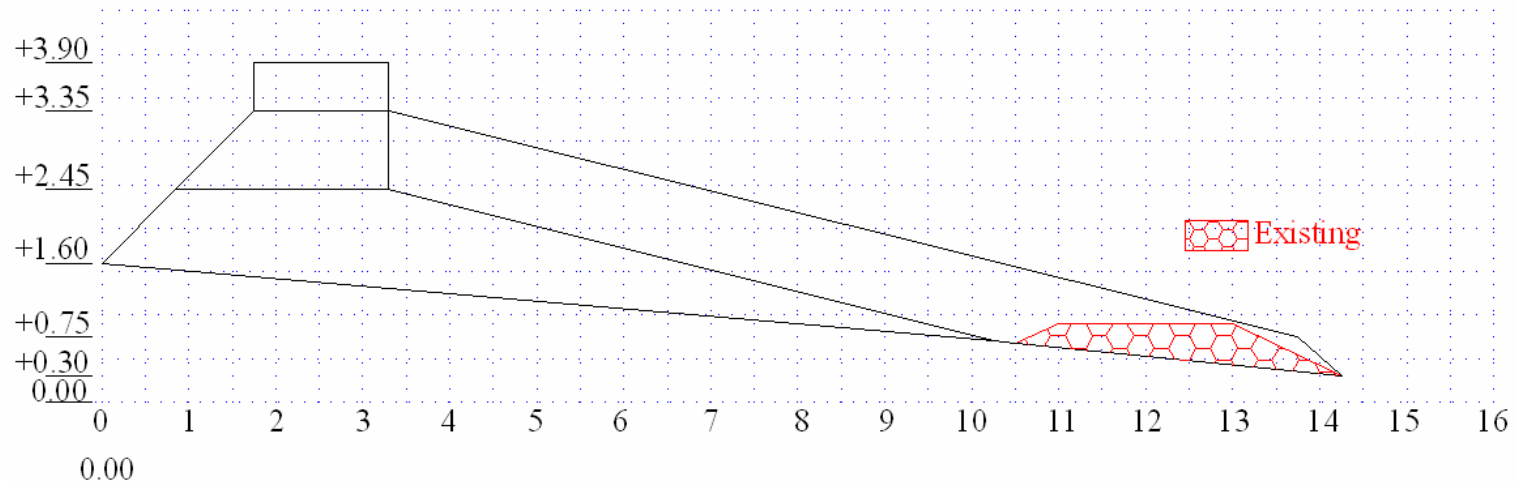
Existing and proposed cross-section in Koolimuttam
